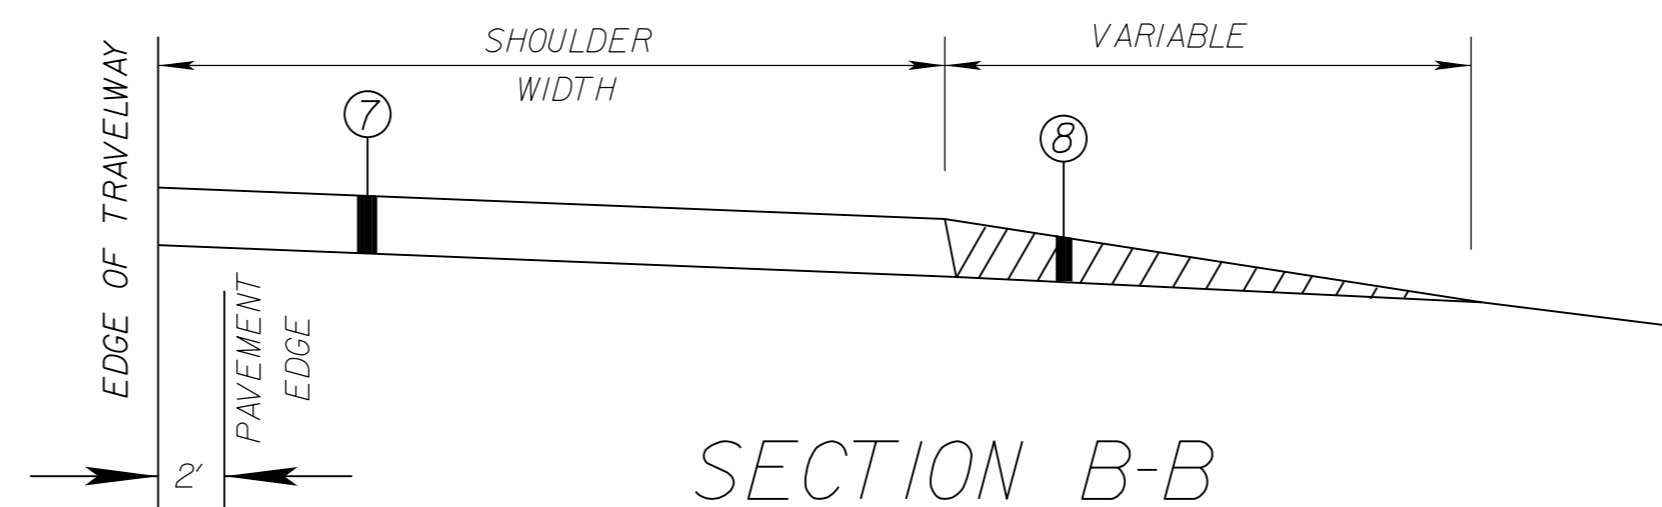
DETAIL FOR PAVEMENT TRANSITION AT BRIDGE ENDS
